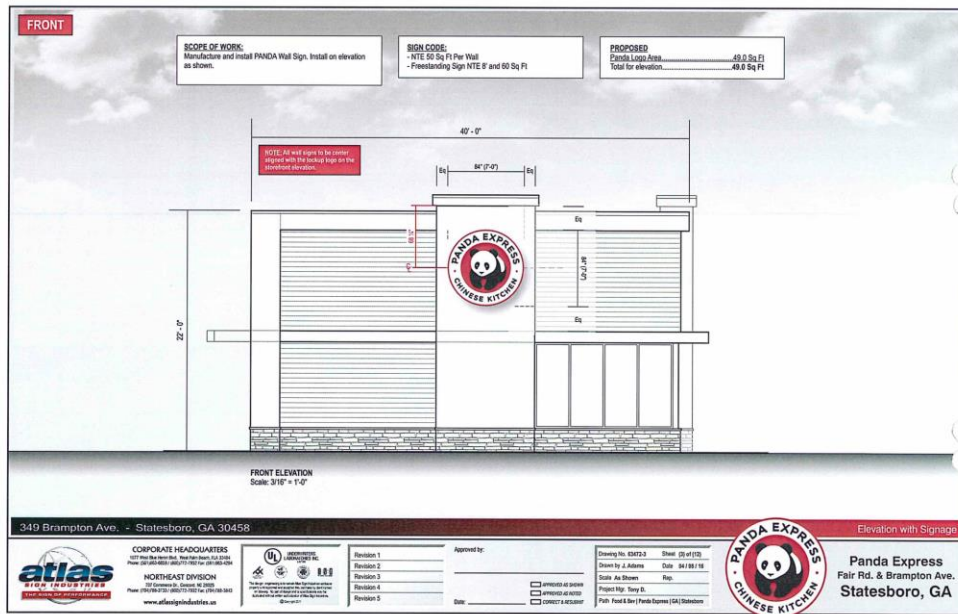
49 Square Feet Wall Sign at Archway Drive Elevation: Approved June 17, 2016
